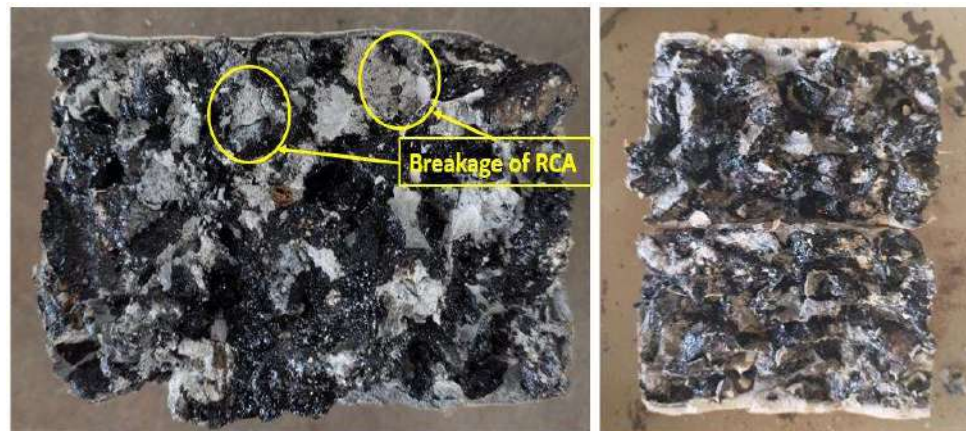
Failure surface morphology of SFA mixtures with (a) RCA (b) FCS
